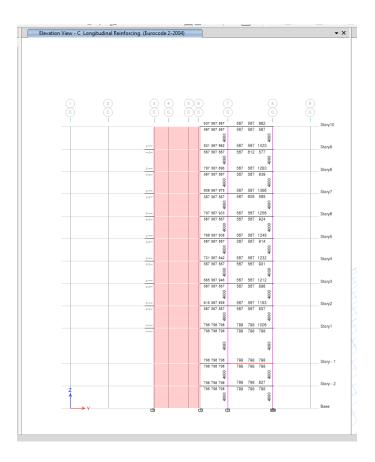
Concrete frame design ETABS output (Longitudinal reinforcement, Elevation view C-AXIS
